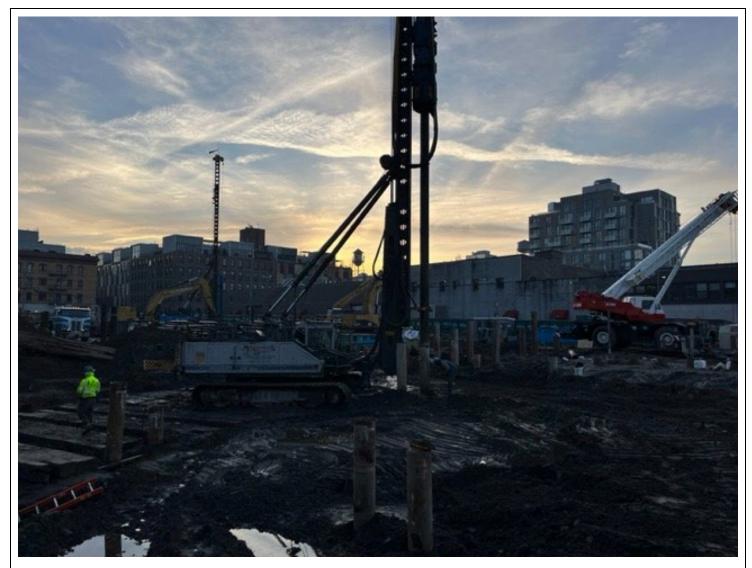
Looking Southeast; CCJV backfilling in grid cell SC-7 while installing foundation footings.
